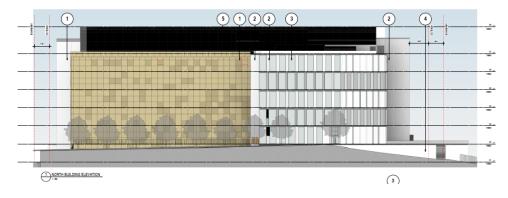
Proposed North Building Elevation facing Julius Avenue (Source: Greenbox Architecture)
